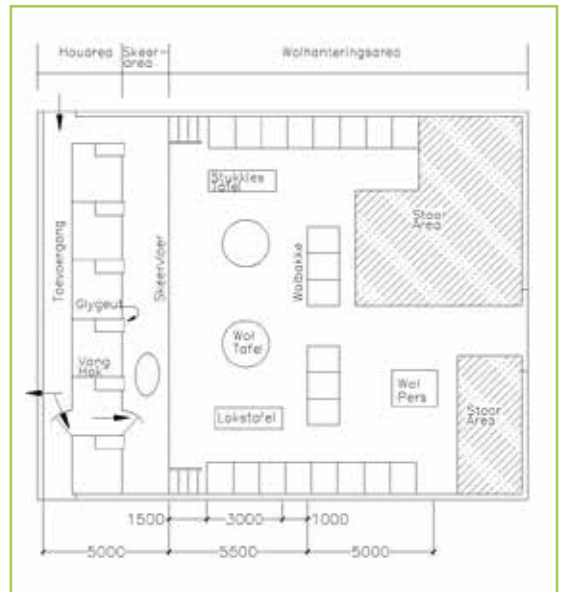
Typical layout and minimum dimensions of a shearing shed.
